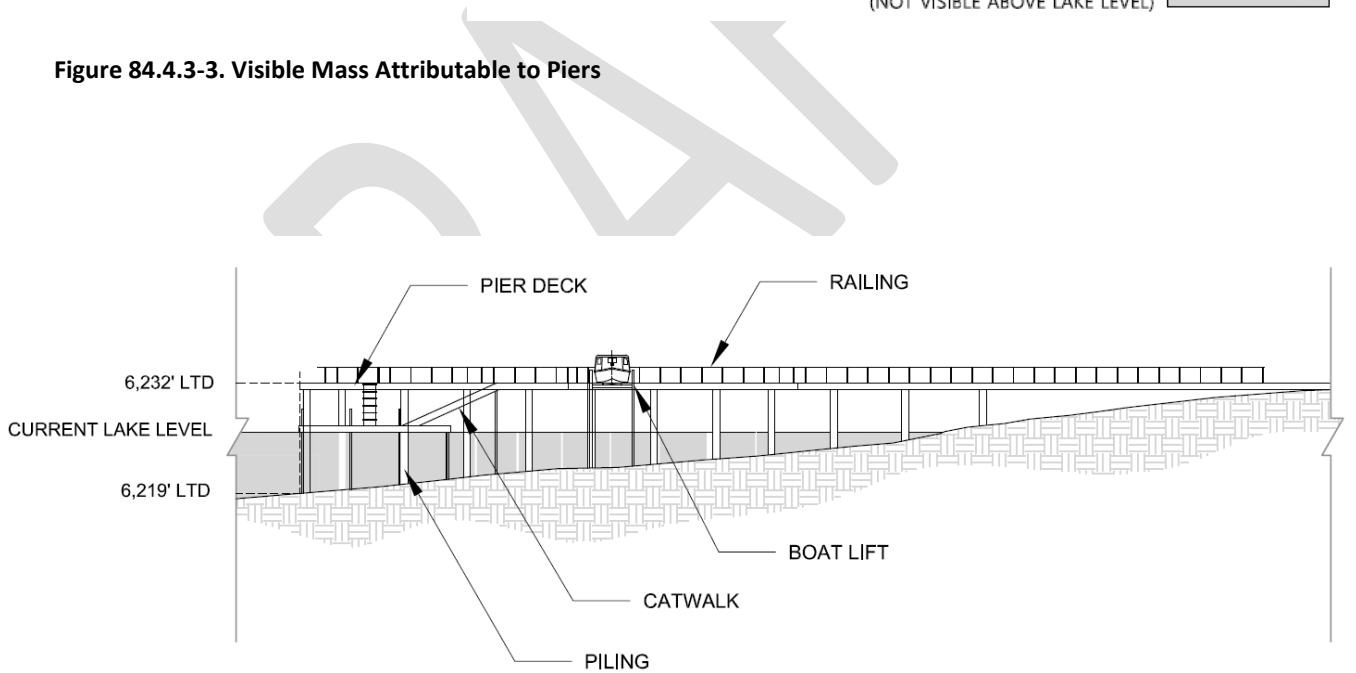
Structural Components Related to Pier Design Standards
